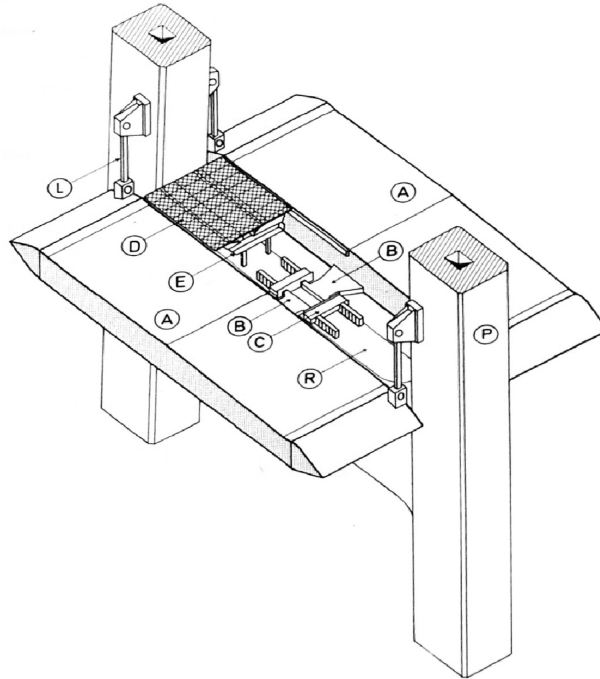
Isometric view of bearing arrangement, and arrangements of joints in bridge deck at main tower of the Lillebælt suspension bridge.
